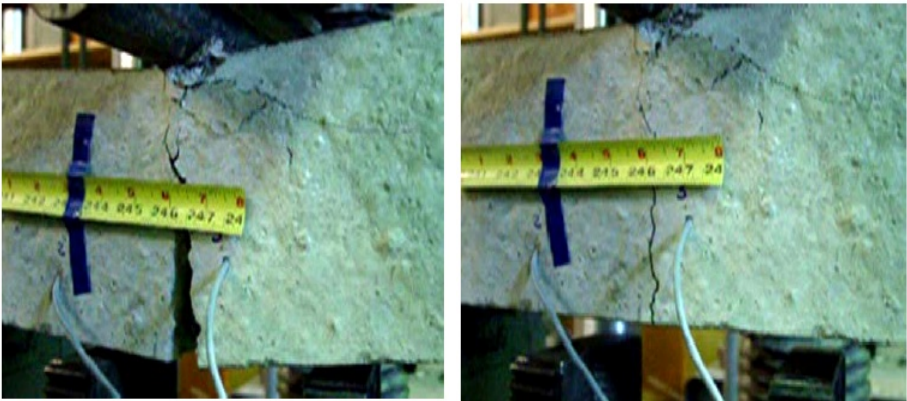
A large crack during a loading test (left) and the crack closed after the loading test (right) [9]
